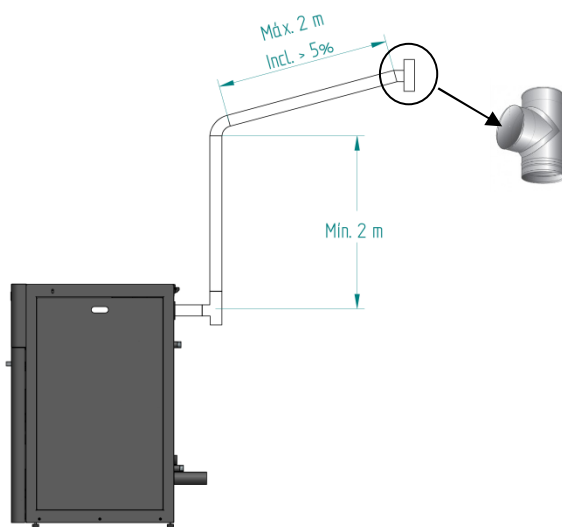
Side view of the boiler installation without a shaft, highlighting the inspection point
